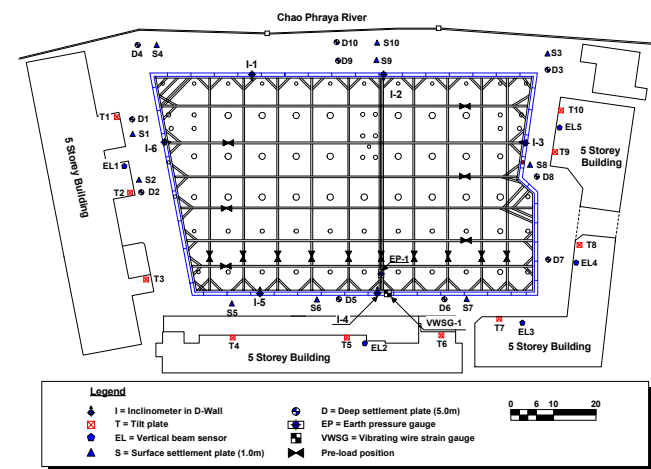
Layout of temporary bracing and instrumentation (Second Building)
